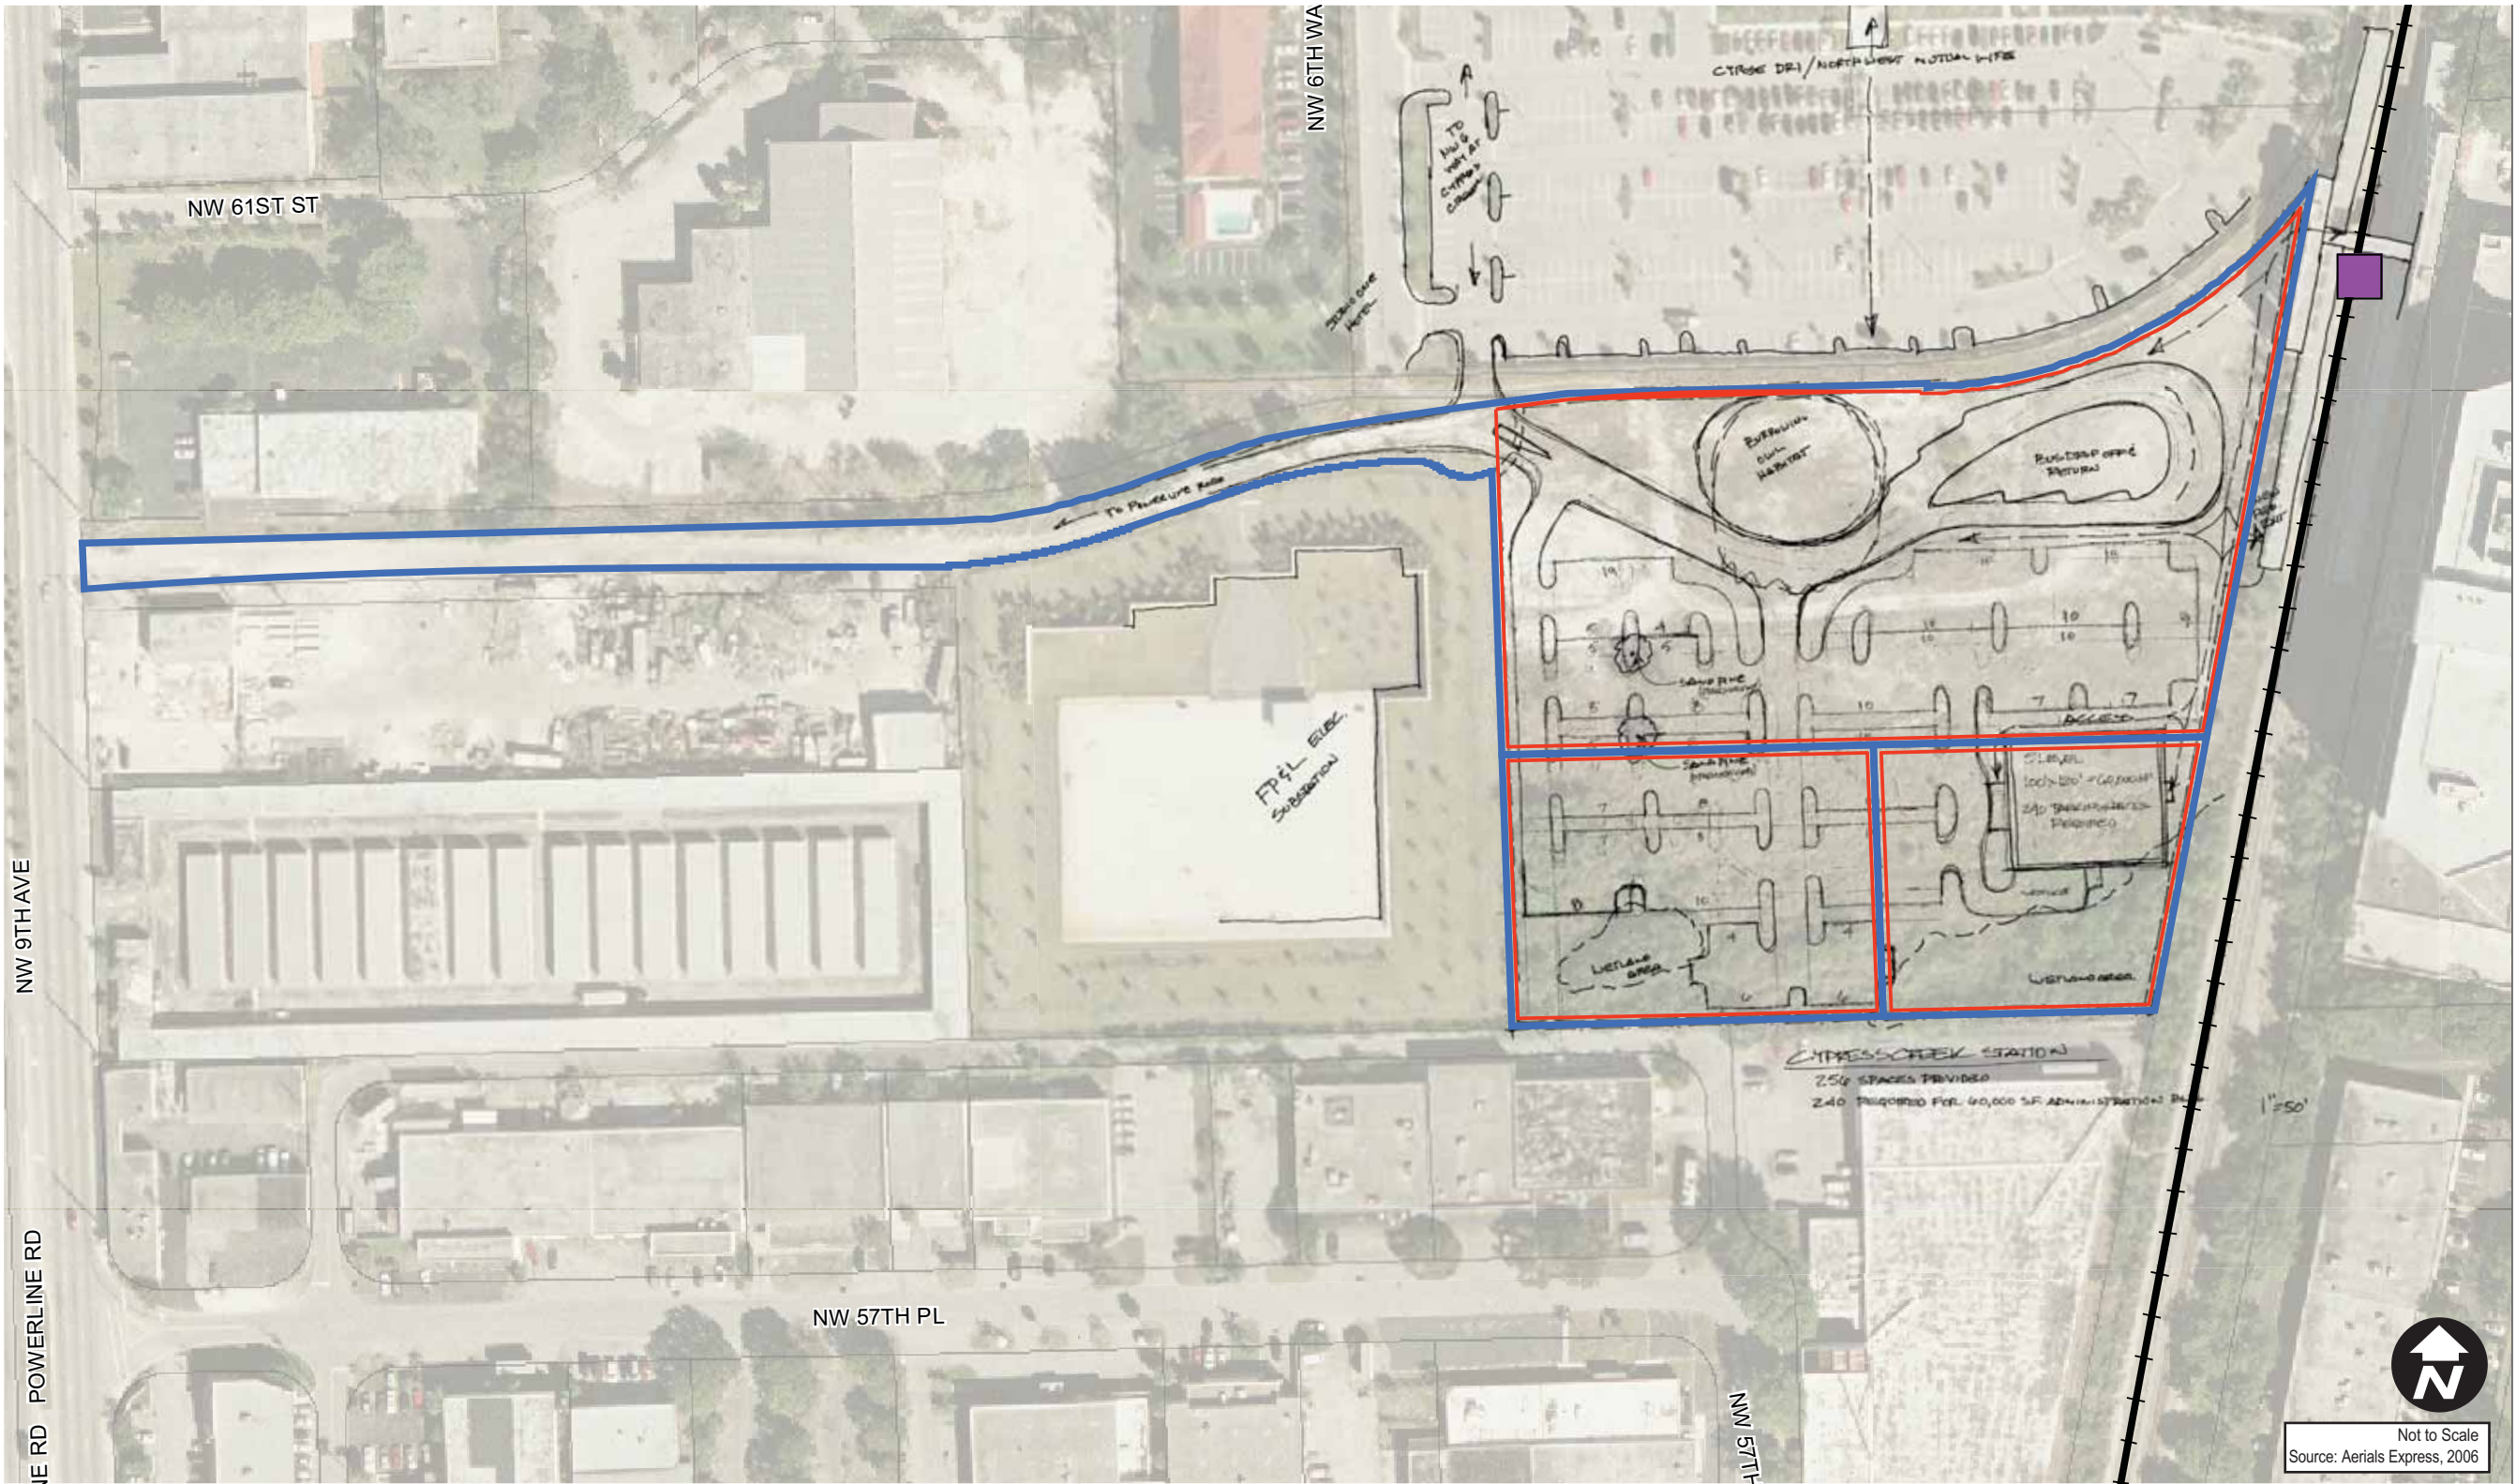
Cypress Creek Station - Conceptual Site Plan
